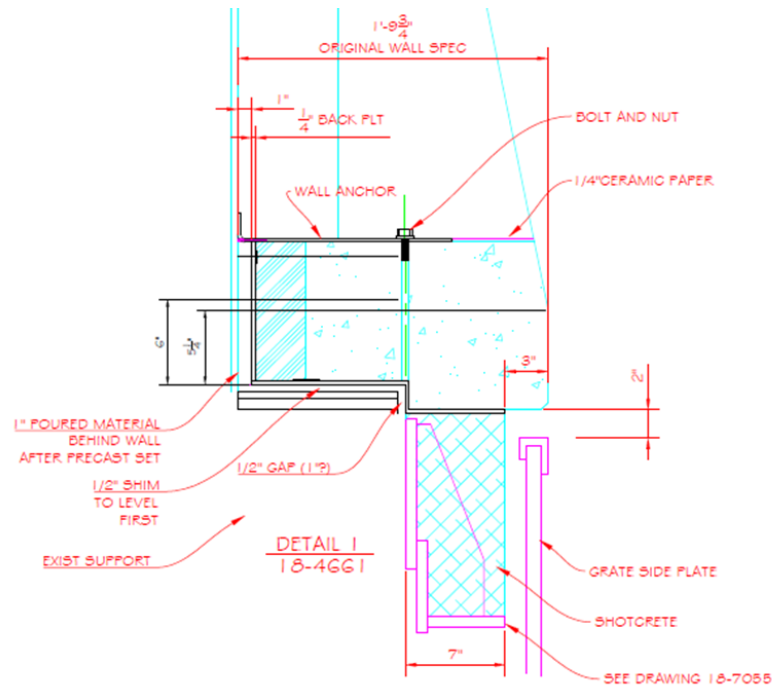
CAD Drawing Cross Section of Newly Designed Refractory Lining – Furnace No. 12
